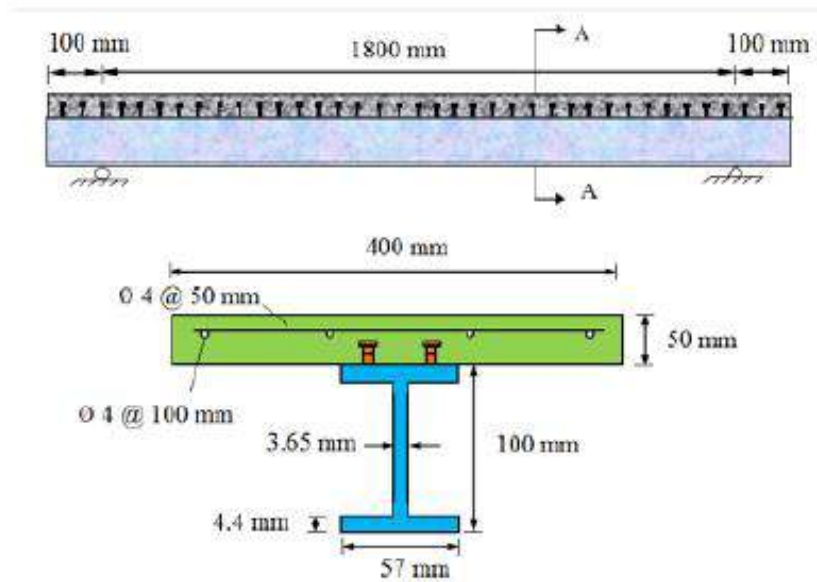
Typical Simply Supported Beam Layout (All dimensions in mm).
